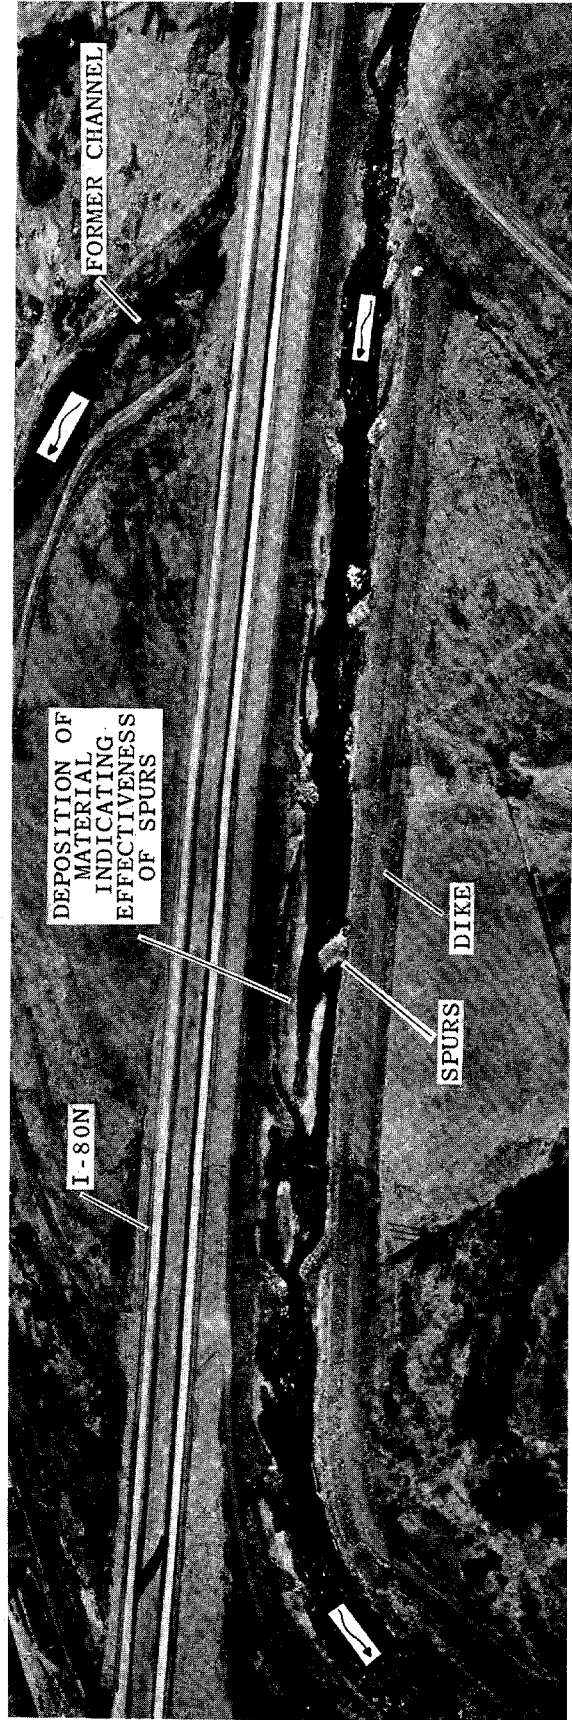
Aerial view of channel change in 1973, four years after construction. (From Oregon Dept. of Highways.)
